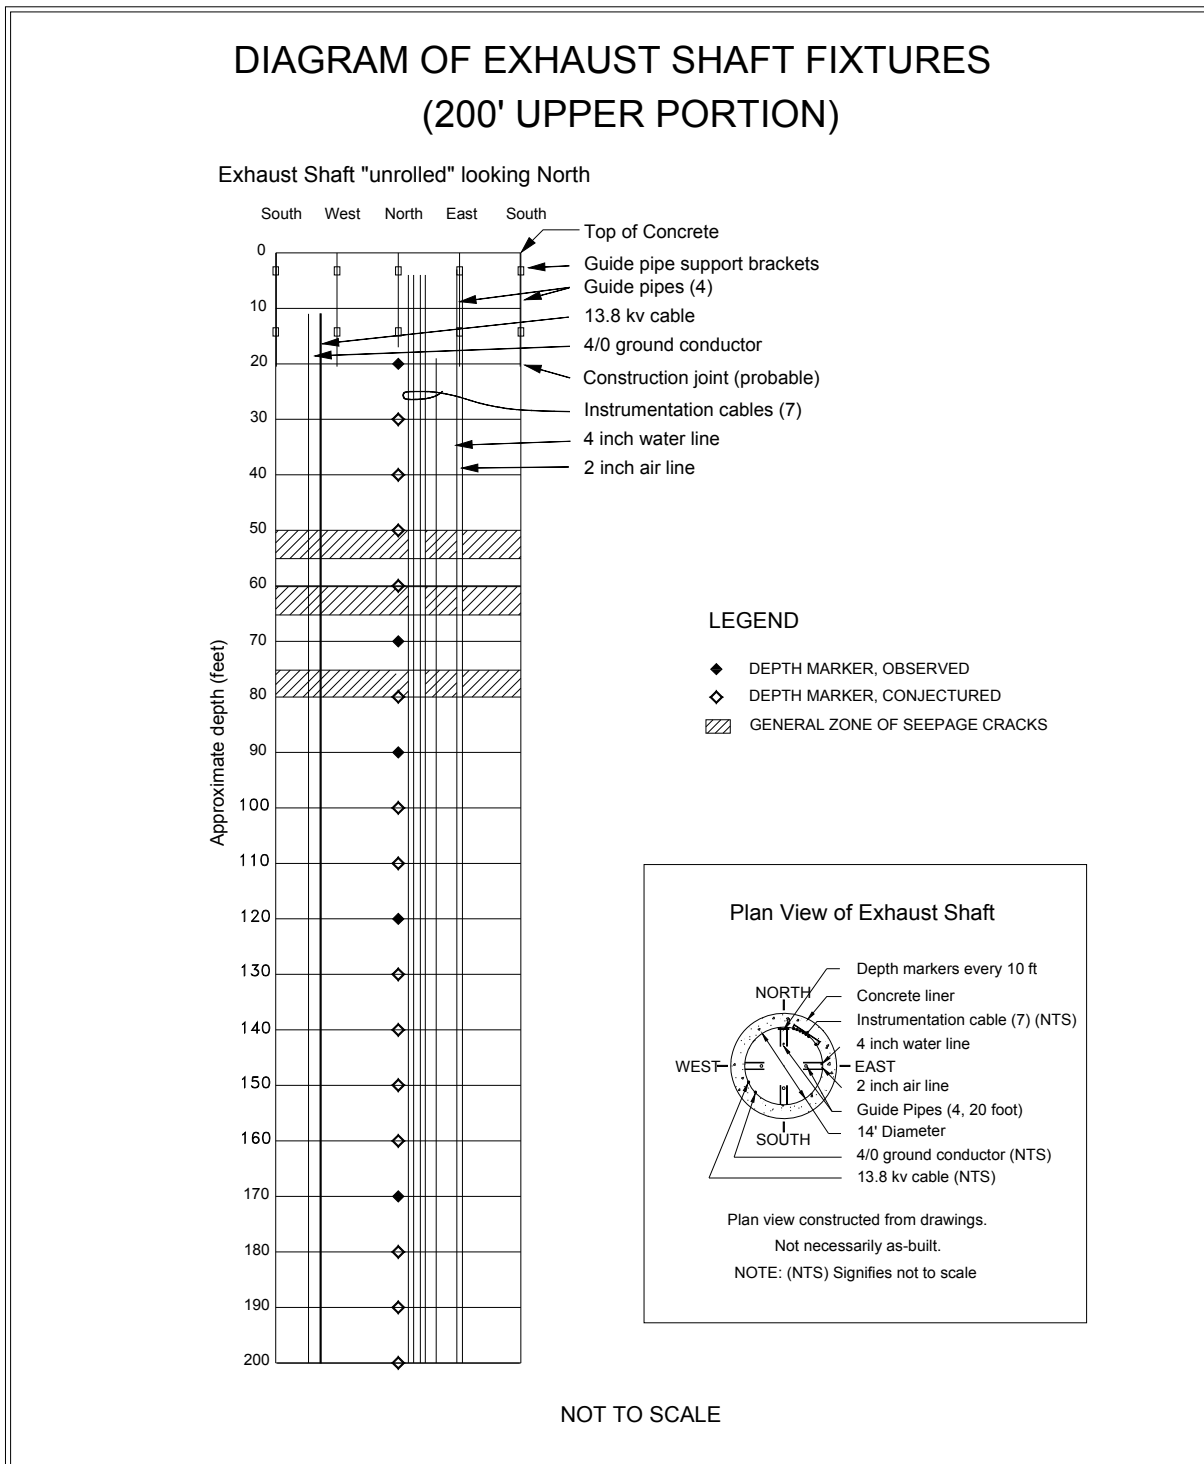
Diagram of Exhaust Shaft Fixtures and Seepage Zones (Upper 200 ft)
